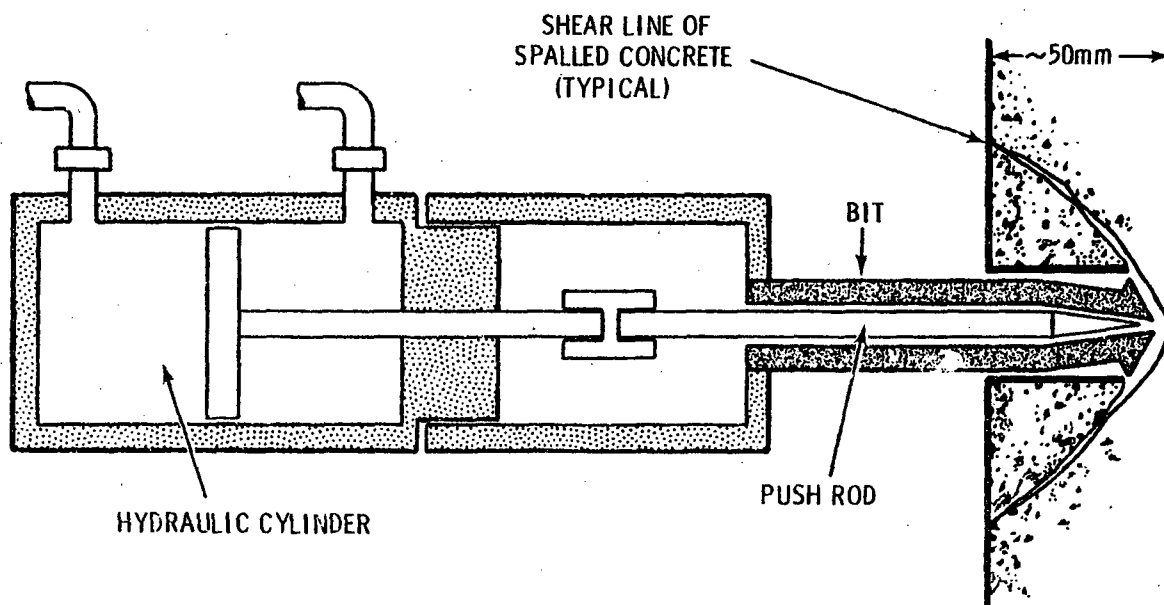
Diagram of Concrete Spaller
